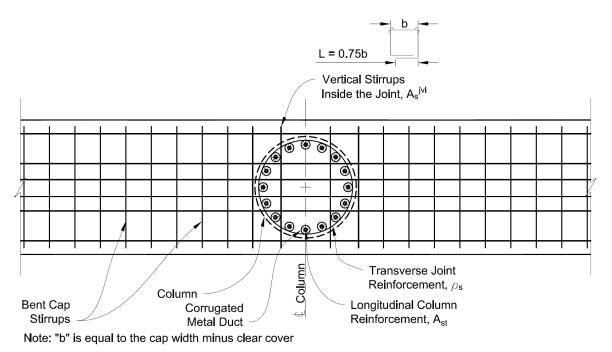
Grouted Duct Joint Shear Reinforcement Details (Plan)—SDC B
